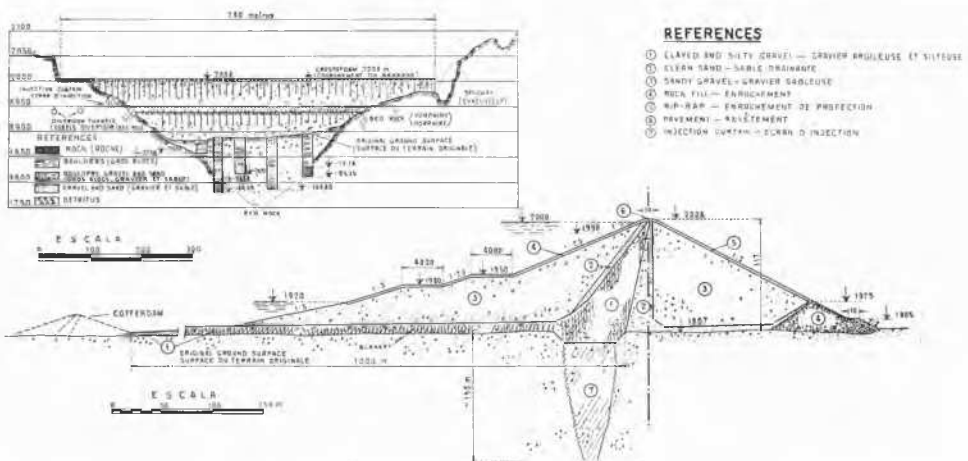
Longitudinal foundation profile and cross section of the El Horcajo dam.
